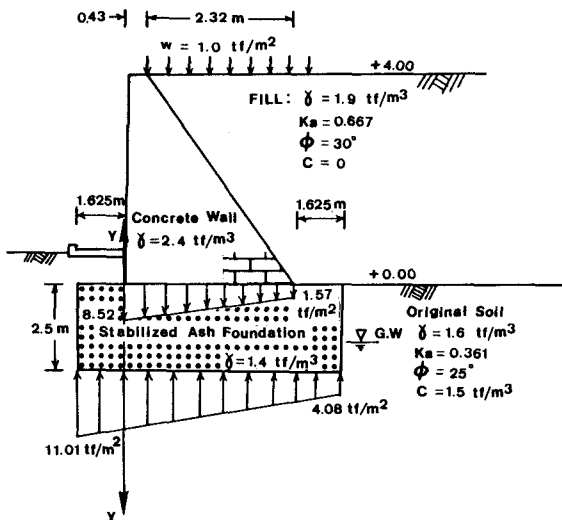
Application of stabilized ash for foundation designed to support a retaining wall system.
